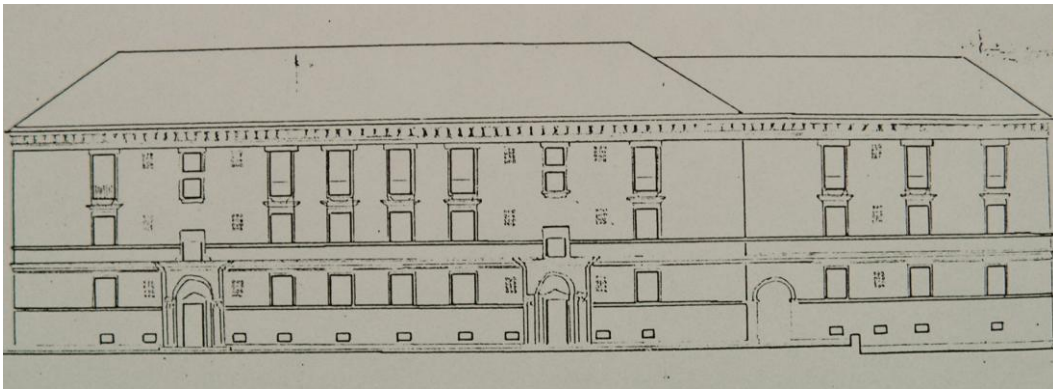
Façade collective dwellings (1953). Ante-project. Architects Gh. Pavlu et al. From AMPH-Igo, A-3/18.
